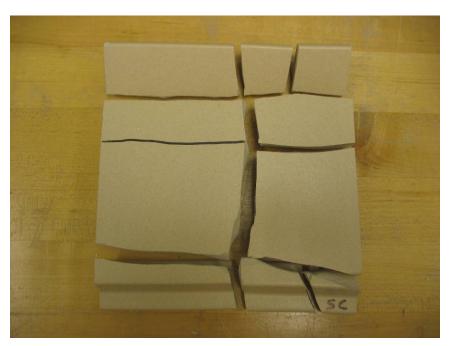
Compressive Strength Same Test Specimen Separated at Cracks
